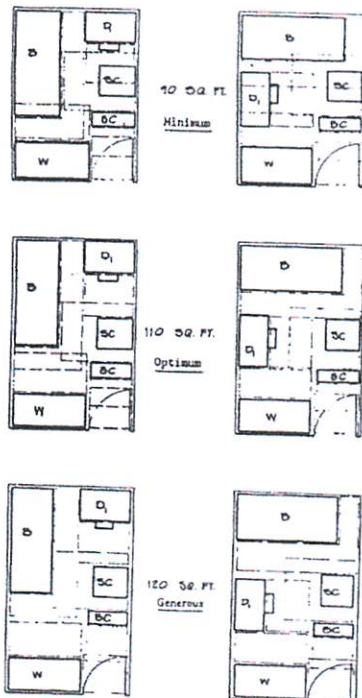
Diagrammatic arrangements, rectangular single rooms
